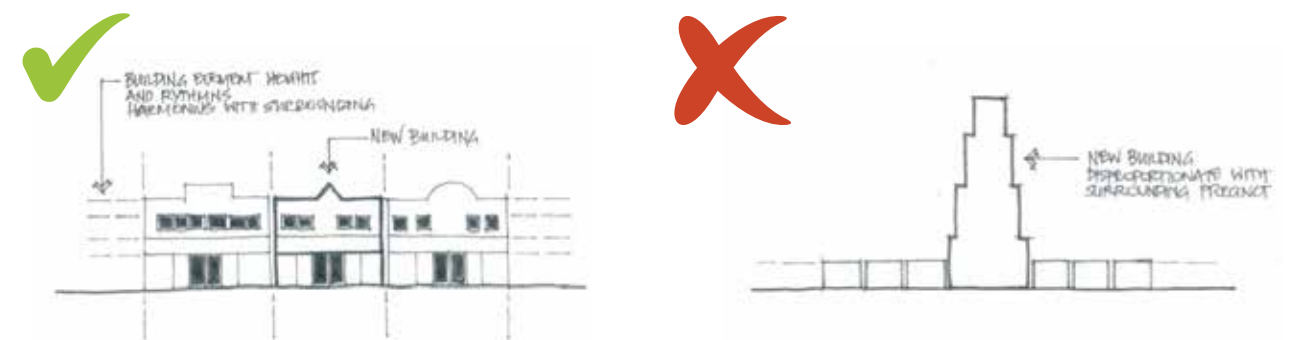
Buildings are harmonious in proportion and scale to buildings in the rest of the street or immediate precinct
